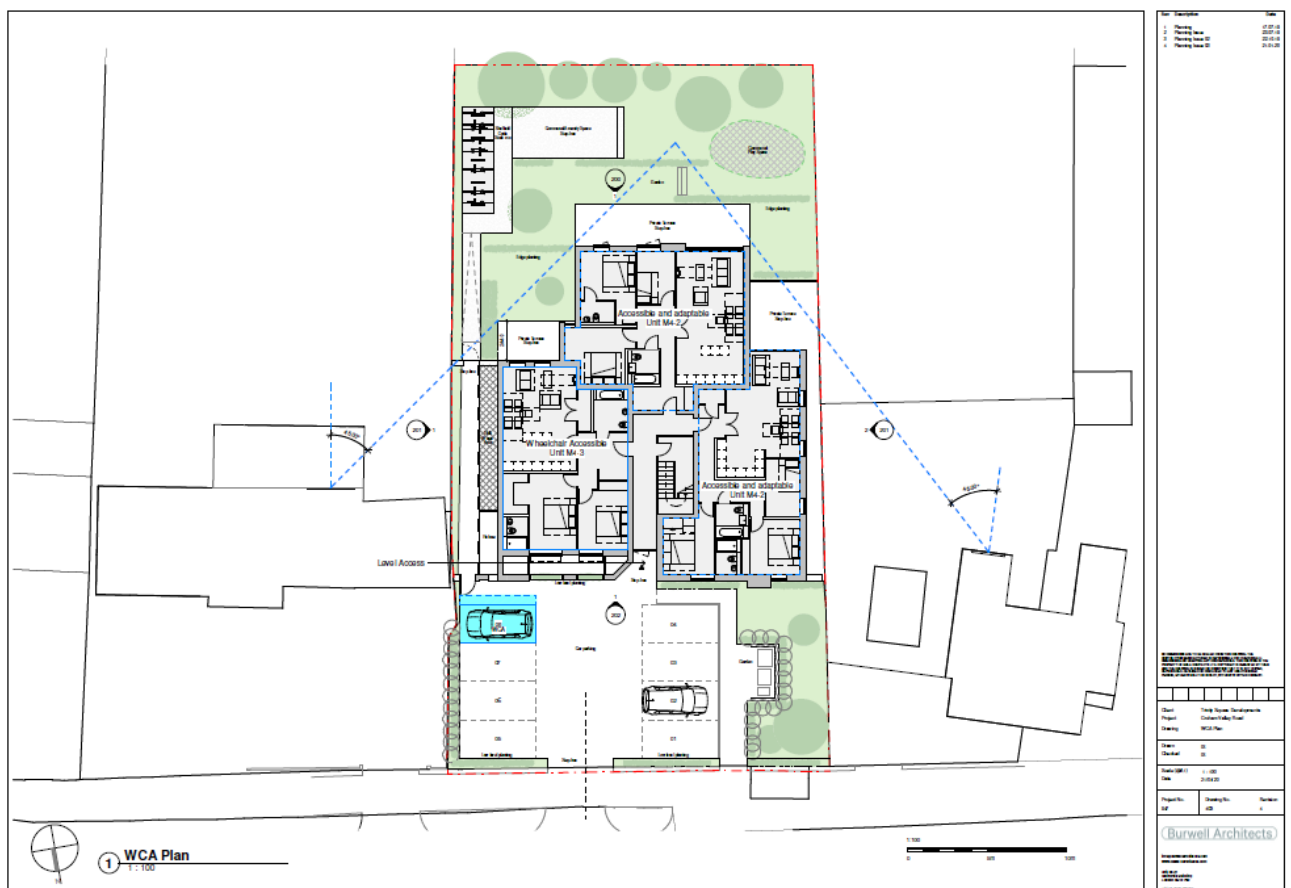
Proposed Block Plan highlighting the relationship with the adjoining occupiers.
